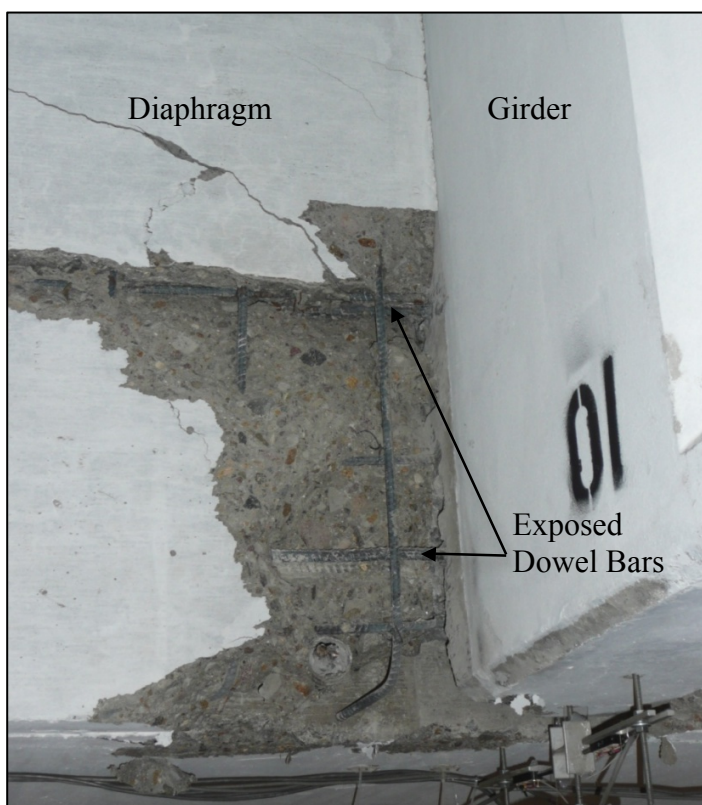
Damage Surrounding the Interior Girder in the As-built Connection Region
